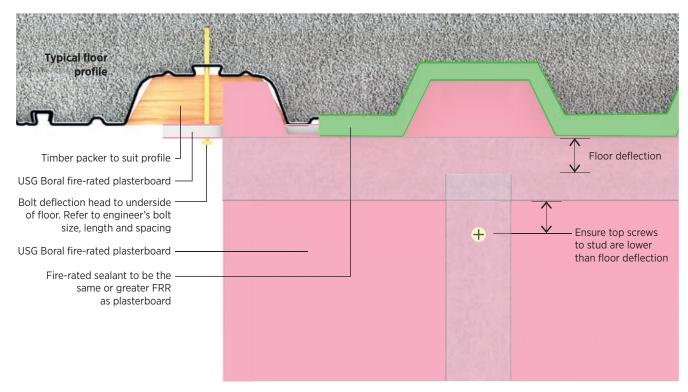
Steel Stud Wall Perpendicular to Rib Profile
